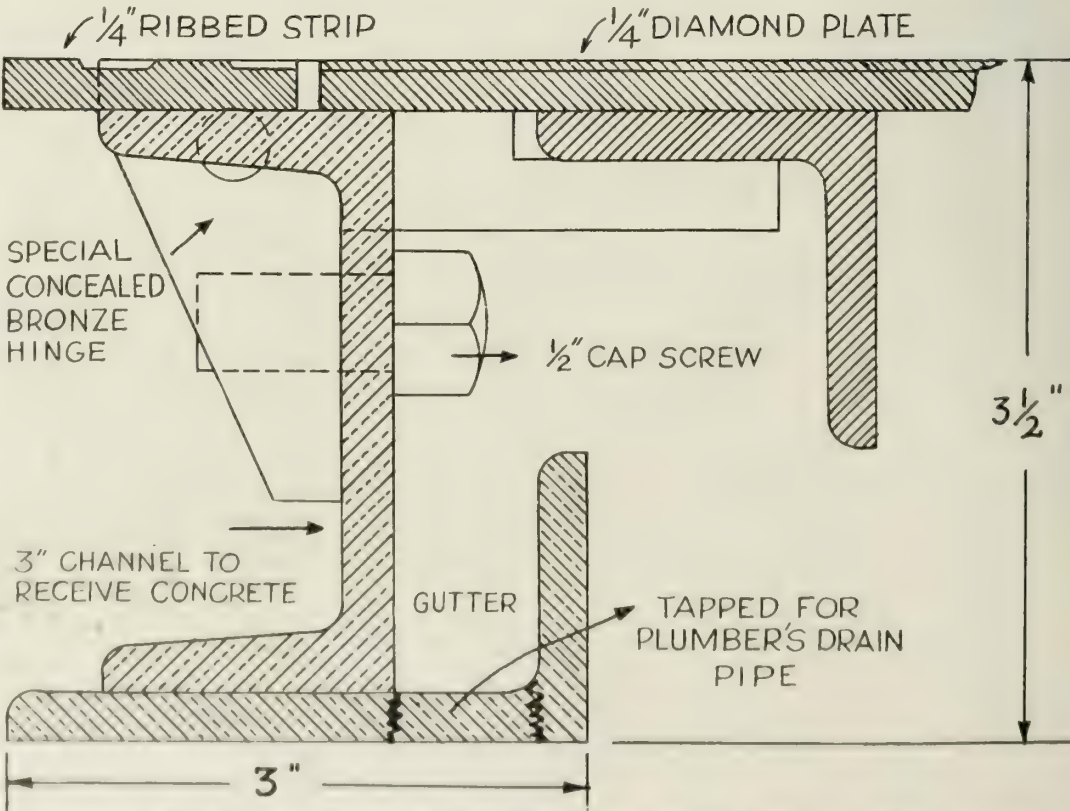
CONSTRUCTION OF G&G FLUSH WATERTIGHT SIDEWALK DOOR
